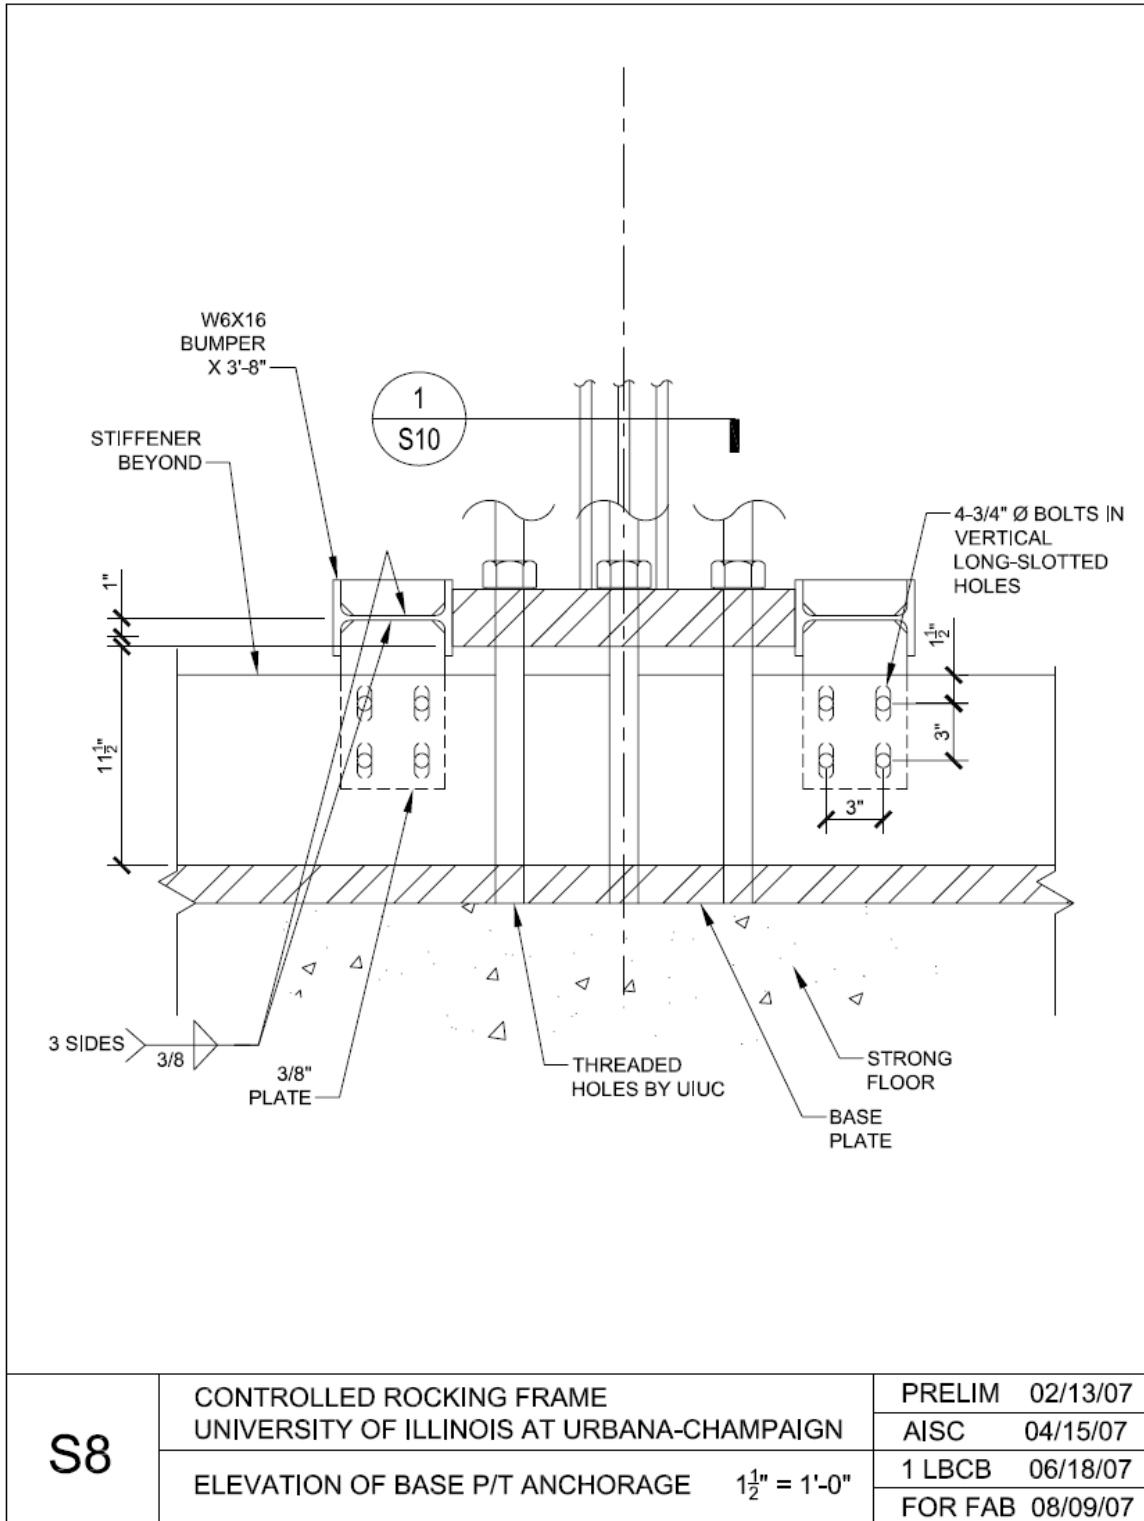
Specimen Design Drawing – Elevation of Base Post-Tensioning Anchorage
